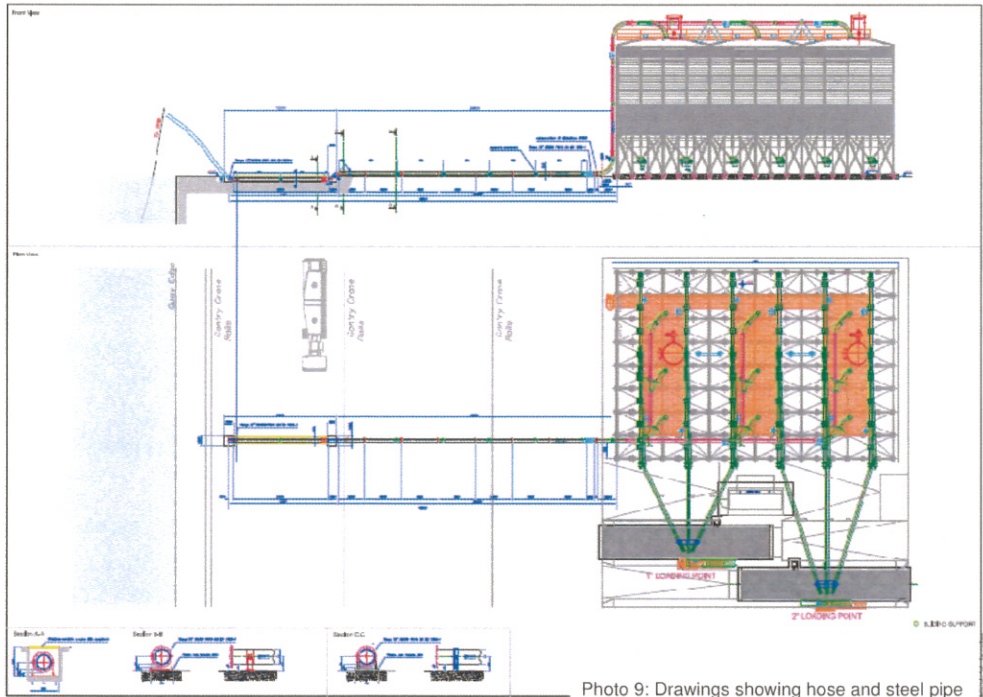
Drawings showing hose and steel pipe routing from ship discharging cement dust to silos.
